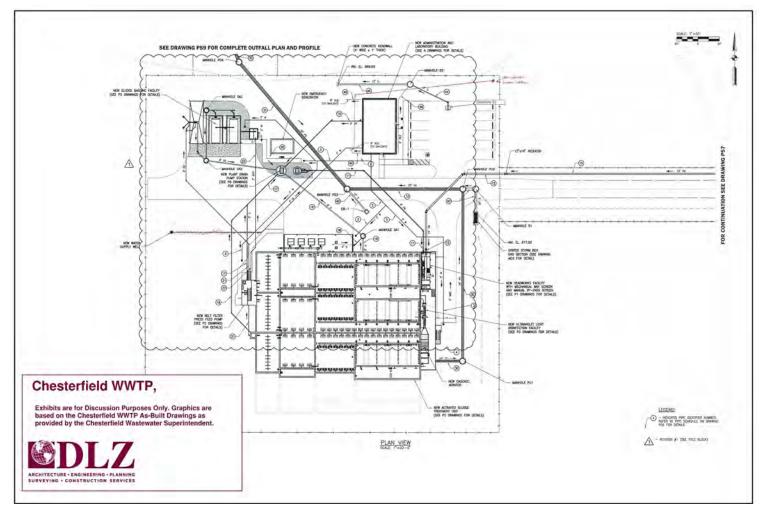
Overall Existing Chesterfield Wastewater Treatment Plant Layout
